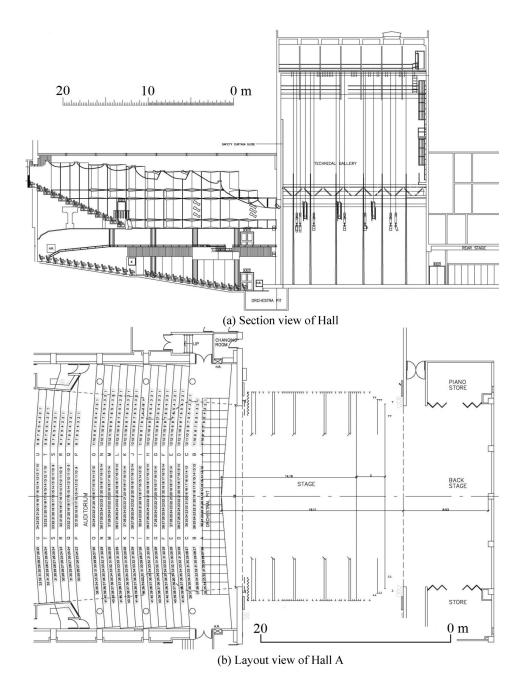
Hall layout and dimensions of hall A. (a) Section view; (b) hall horizontal layout.
